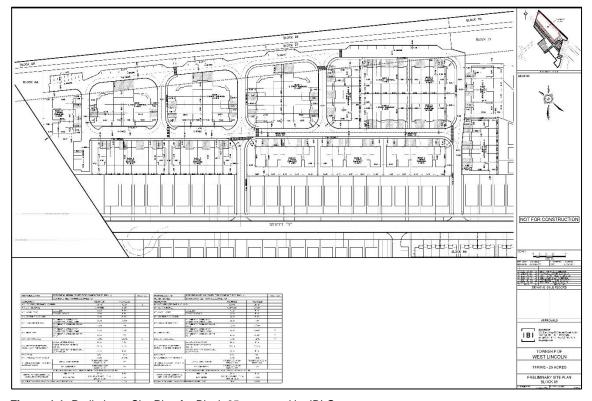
Preliminary Site Plan for Block 65, prepared by IBI Group
